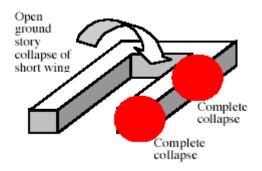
U-shaped plan of commercial- residential building in Bhuj
